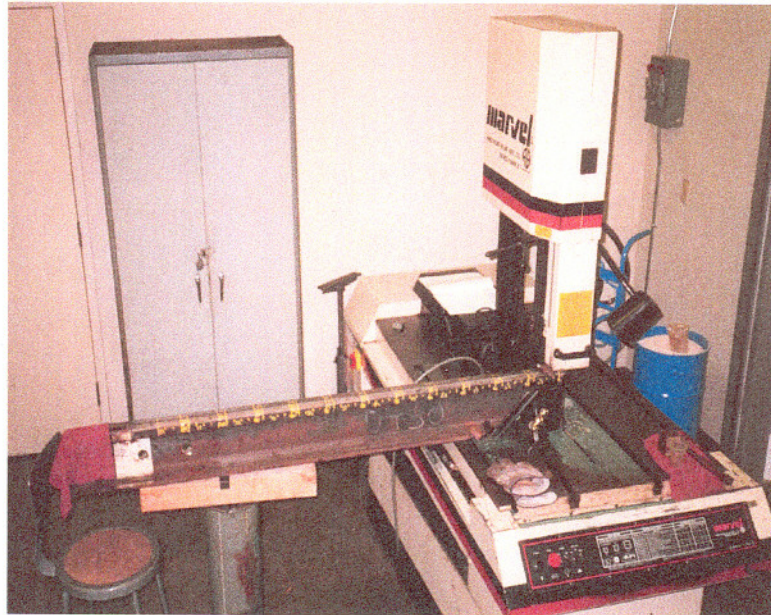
Worn FAST rail prior to sectioning.
